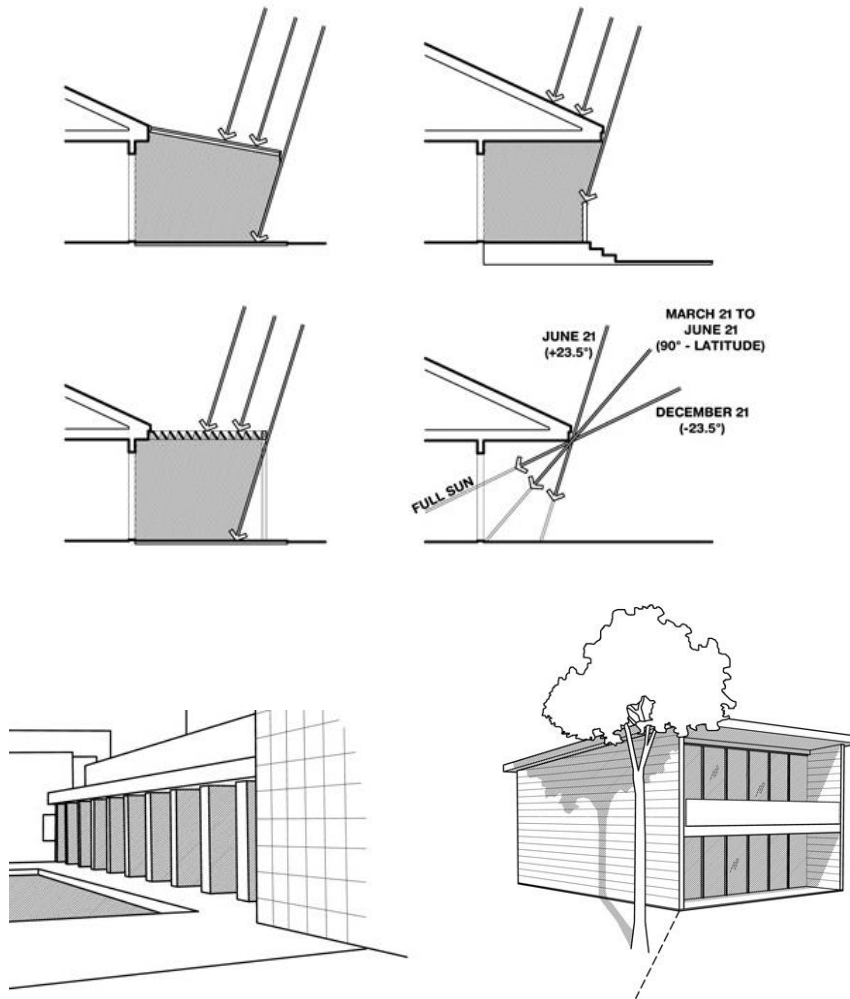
Solar shades are recommended in east, West and South facades of all buildings
